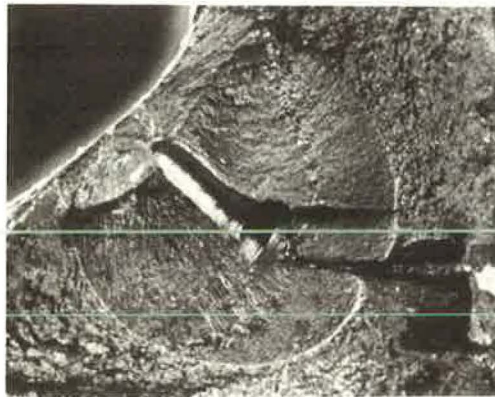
Crack in flange-to-web junction approaching the extreme fiber of the tension flange (~x2.1).
